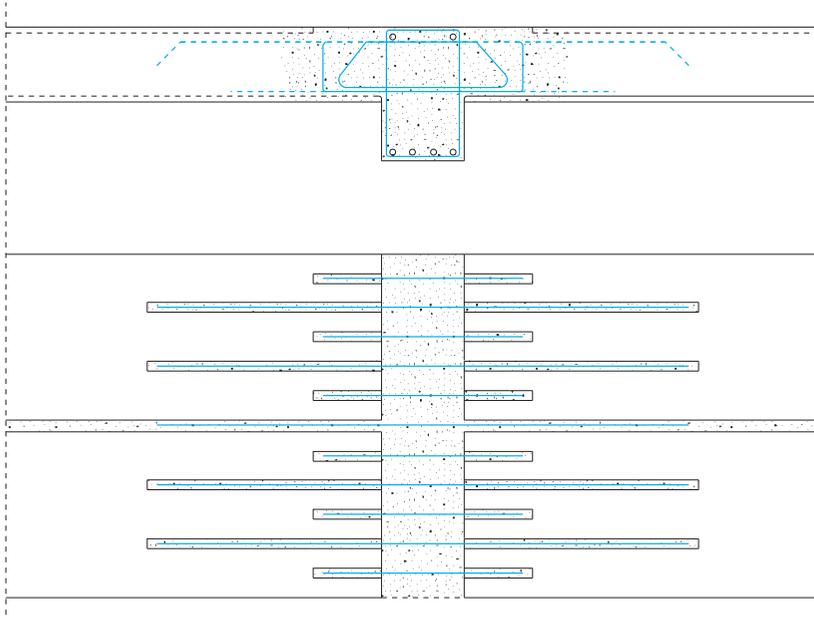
An example of stirruping of the in situ cast nuclei in the cores and in the longitudinal union.
